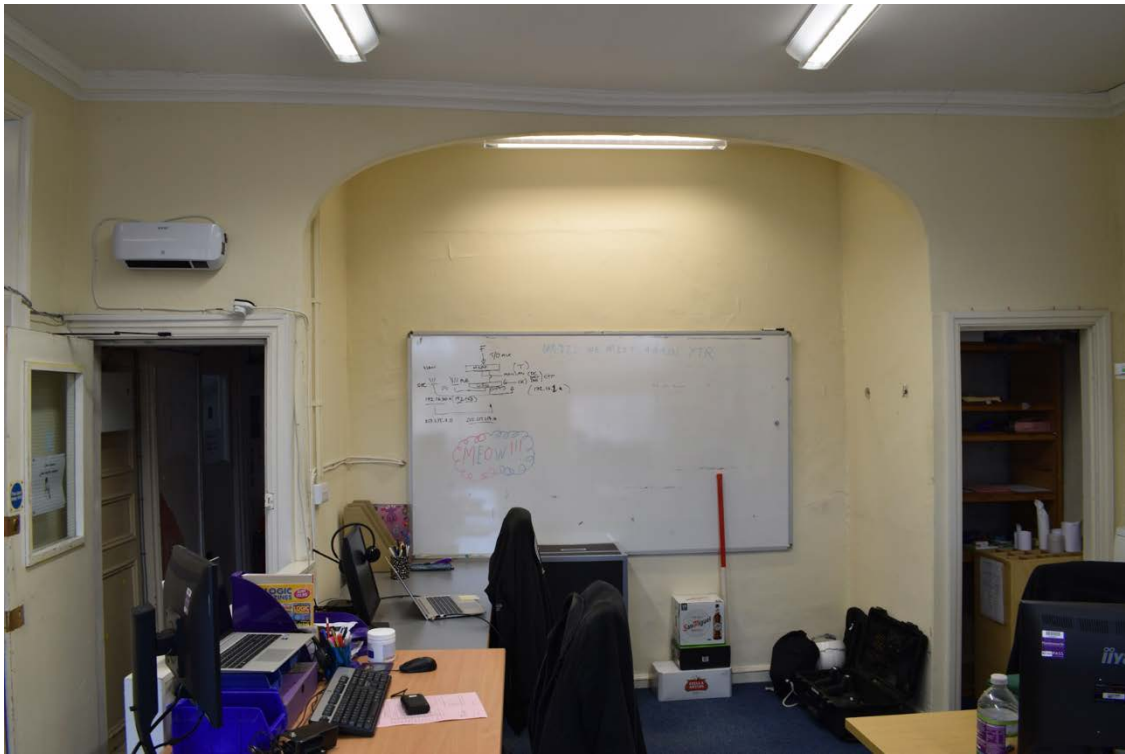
North wall of Wilkinson's bedroom showing doorway, cornice, bed niche and built-in cupboard (Author 2022).
